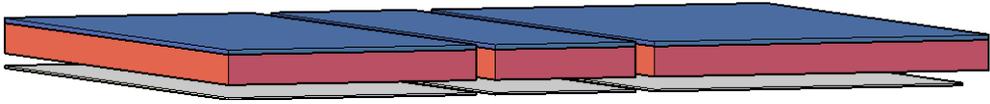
Construction of ceiling of the modeled passive house (external barrier and ring beam layers are turned off)
